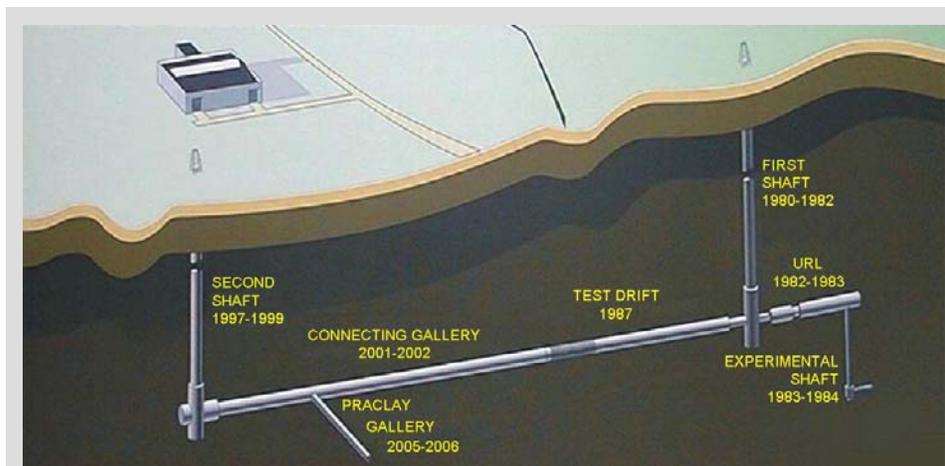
Construction history of the underground research facility HADES. The 80-metre-long connecting gallery connects the recently built second shaft to the already existing facility. The construction of the PRACLAY gallery is foreseen for 2005–2006.
